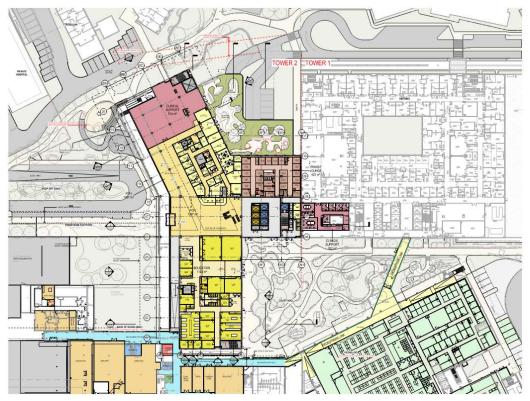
A - Level 01 General Arrangement Plan (Source: BVN)
